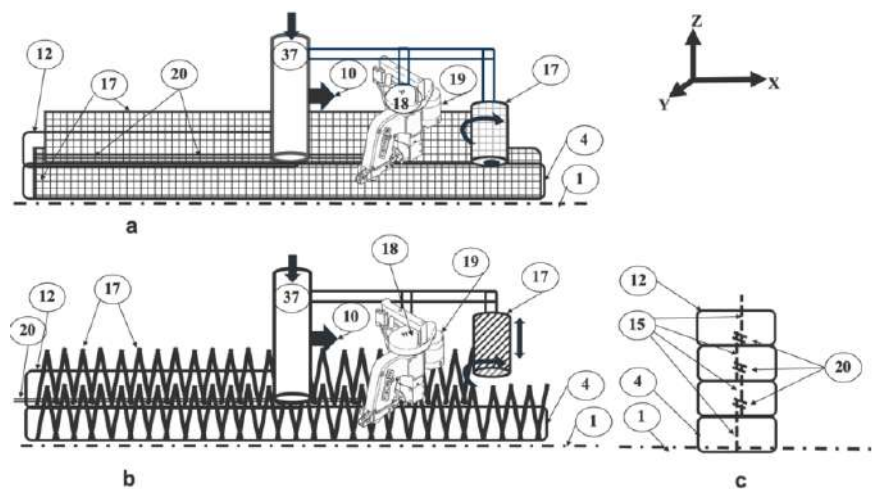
Connecting 1.5 layers reinforcing elements with sewing (a), welding (b) which connects the separately positioned vertical reinforcement together with connection lines (c) [14]
